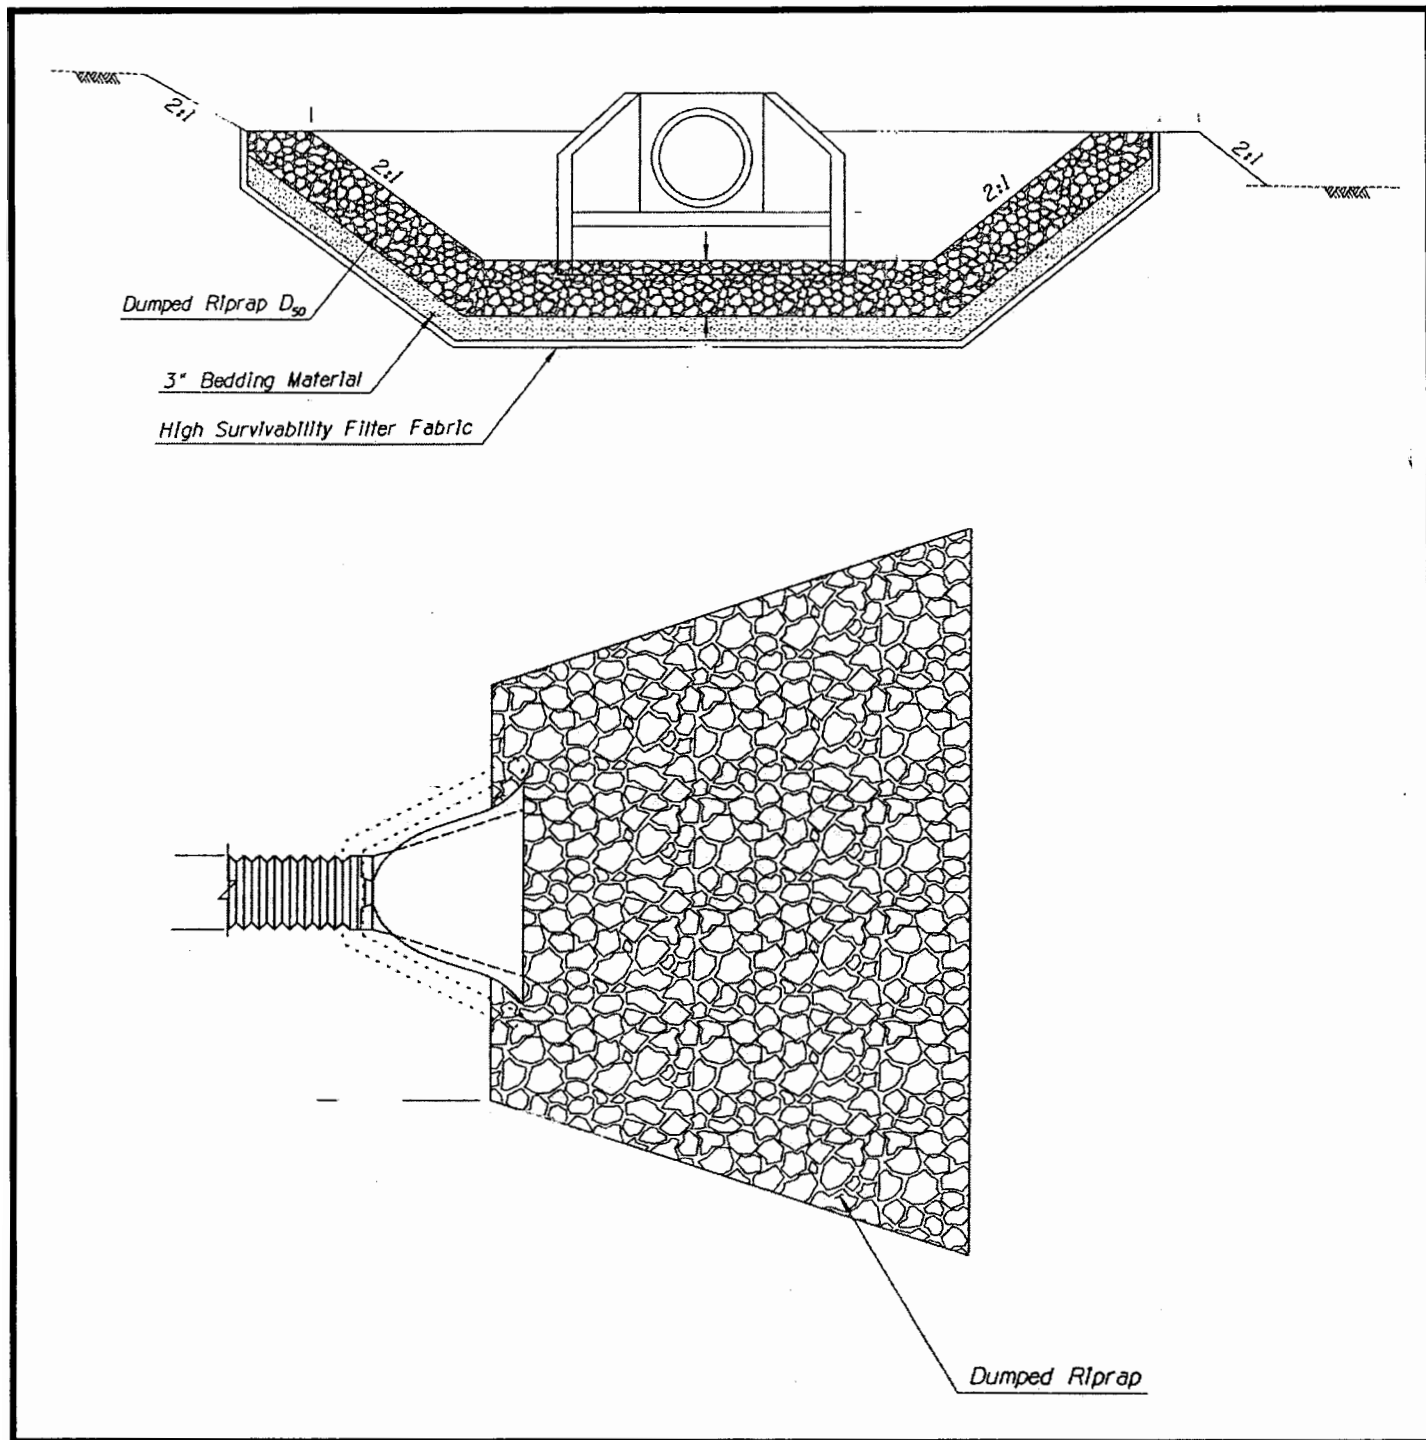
Typical Corrugated Metal Pipe and Riprap Detail
